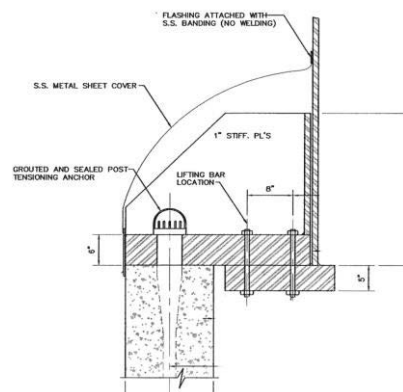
Concrete tower to tubular steel tower connection (adapted from Hau, 2006)
